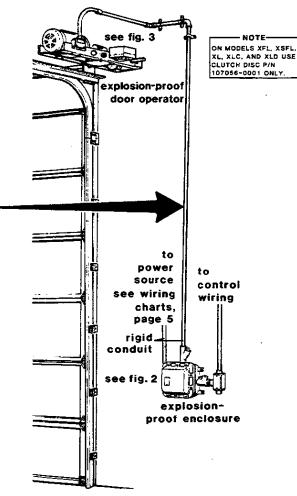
Typical Mounting Arrangement Power Input and Motor Wiring of Explosion-Proof Operator
